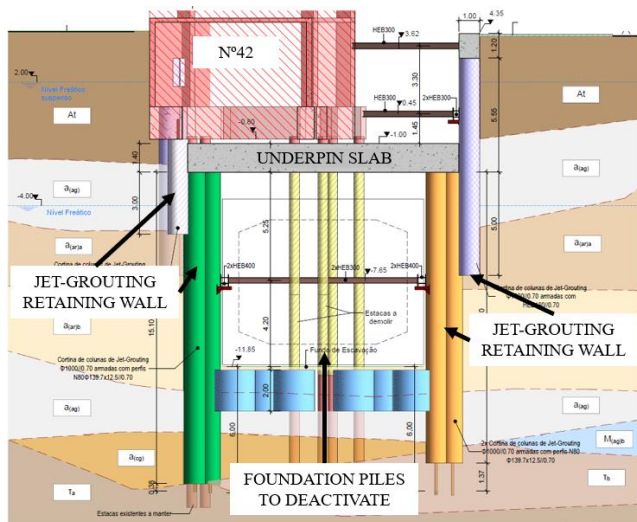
Section: Cut&Cover excavation and underpinning solution.
